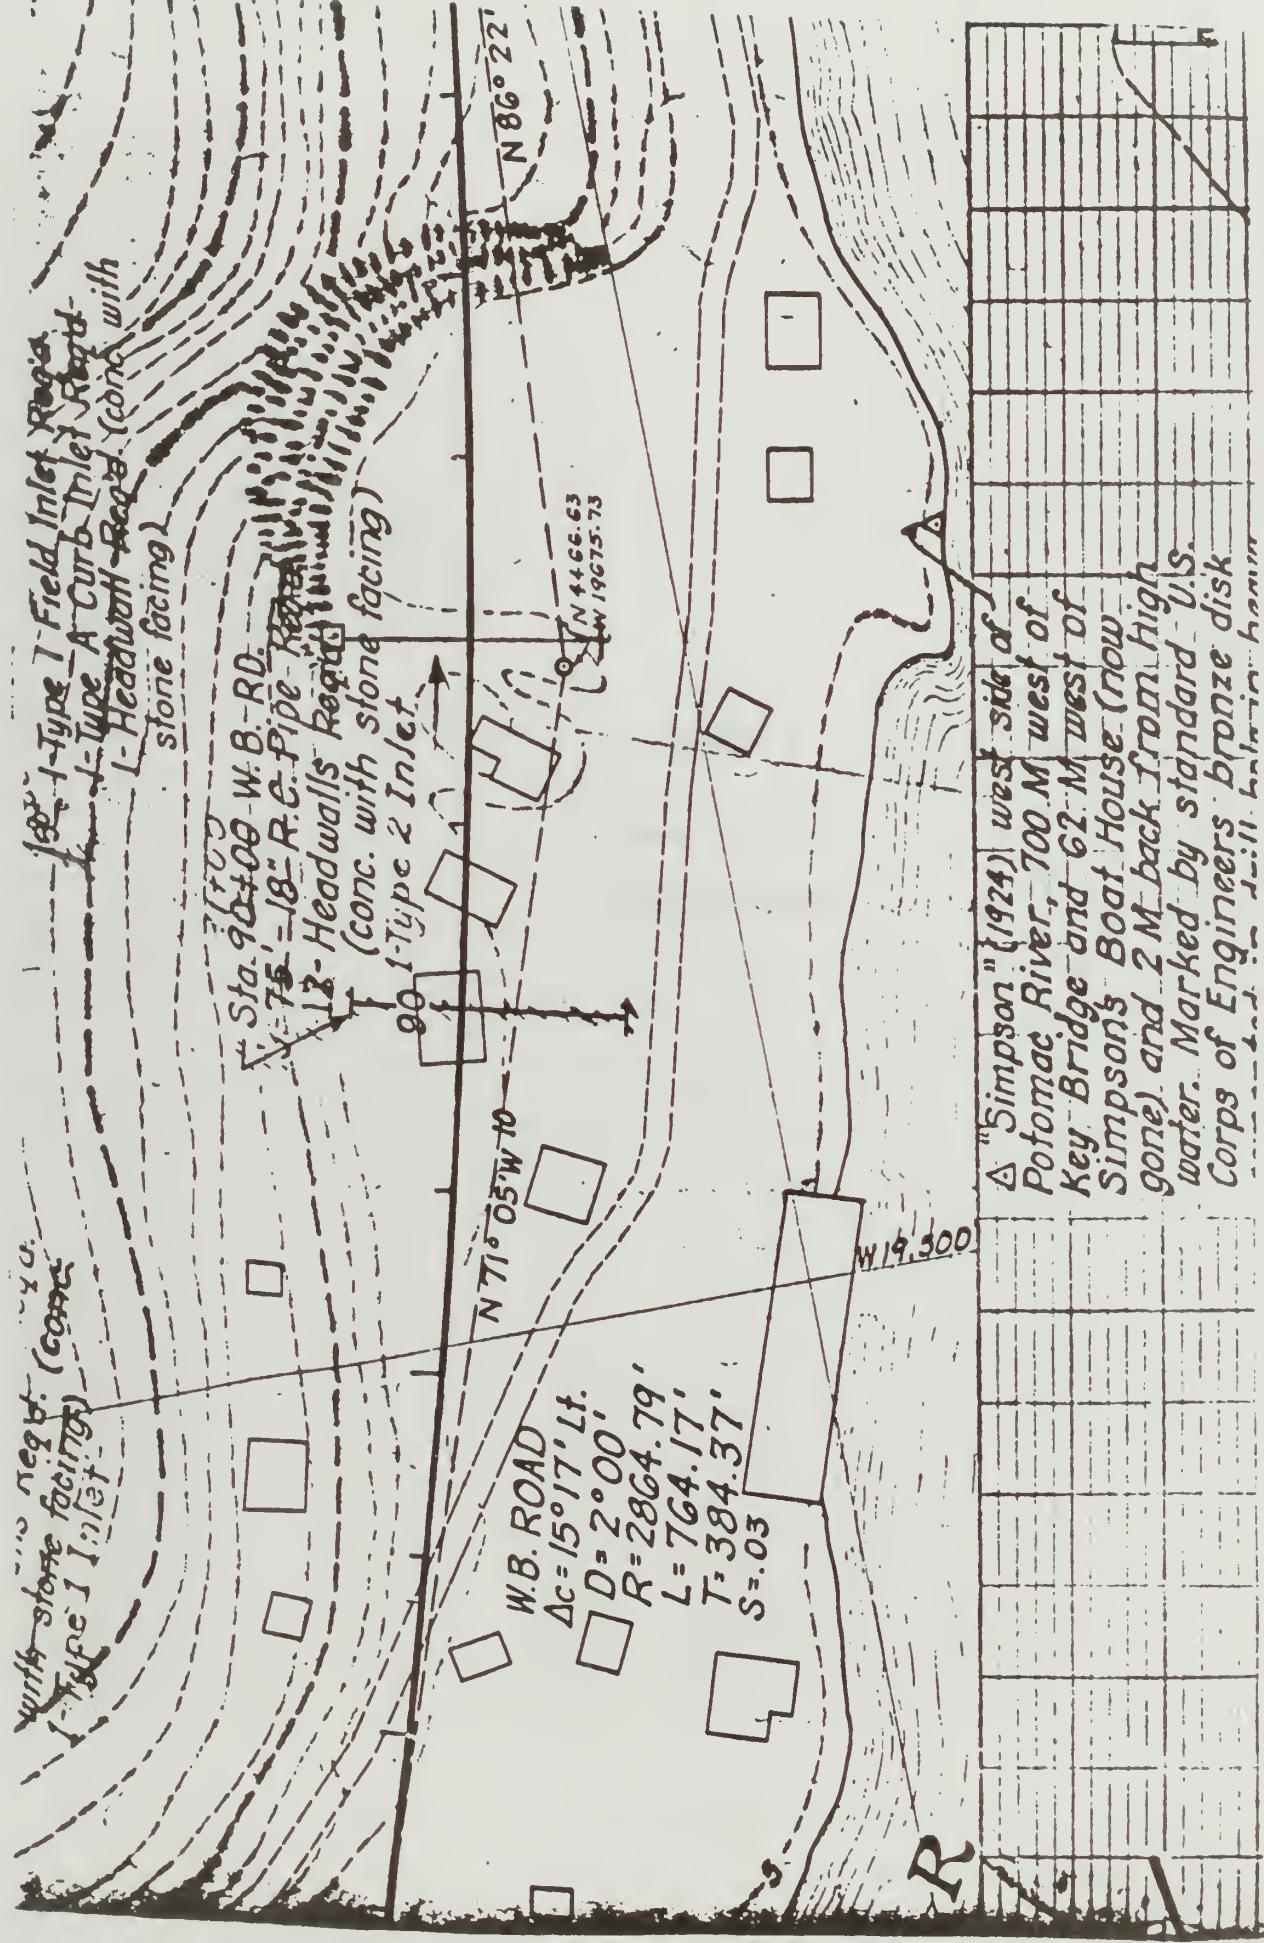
PLATE XXIV: From Plans for Proposed Project 6A12... (Public Roads Administration, 1947, Revised as built, portion page 6 of 46). View of portion of GWMP west of Key Bridge showing several structures impacted when the parkway was constructed. Scale one inch to 100 feet.
